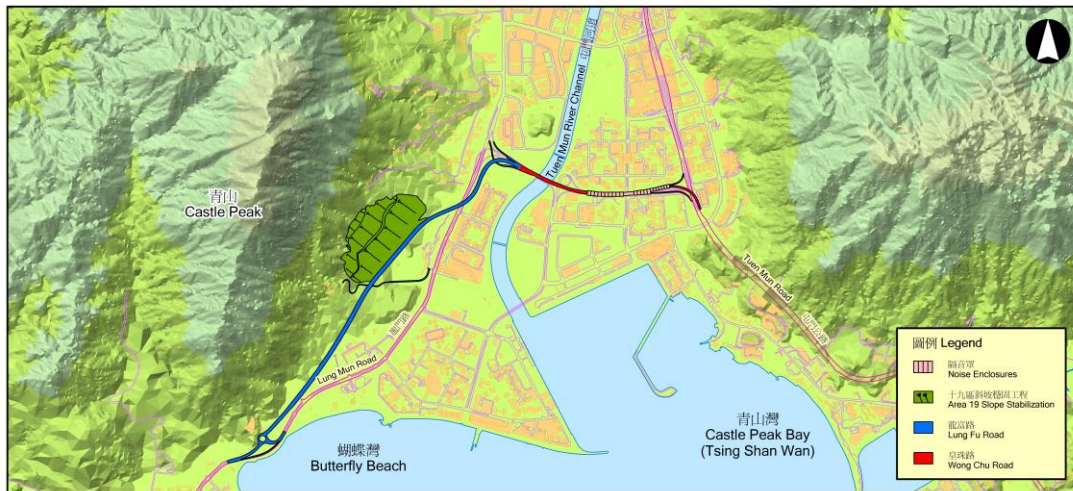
Plan of the route of Foothills Bypass (Lung Fu Road)
